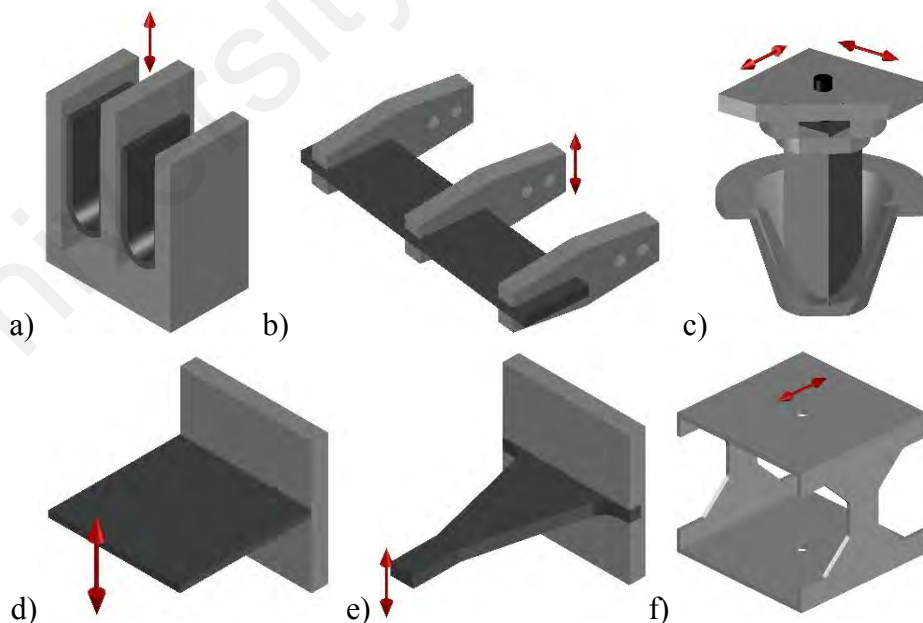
a) U-Shaped steel, b) Torsional beam, c) Flexural beam, d) Single-axis e) Tapered cantilever and f) Taper Tube dampers
